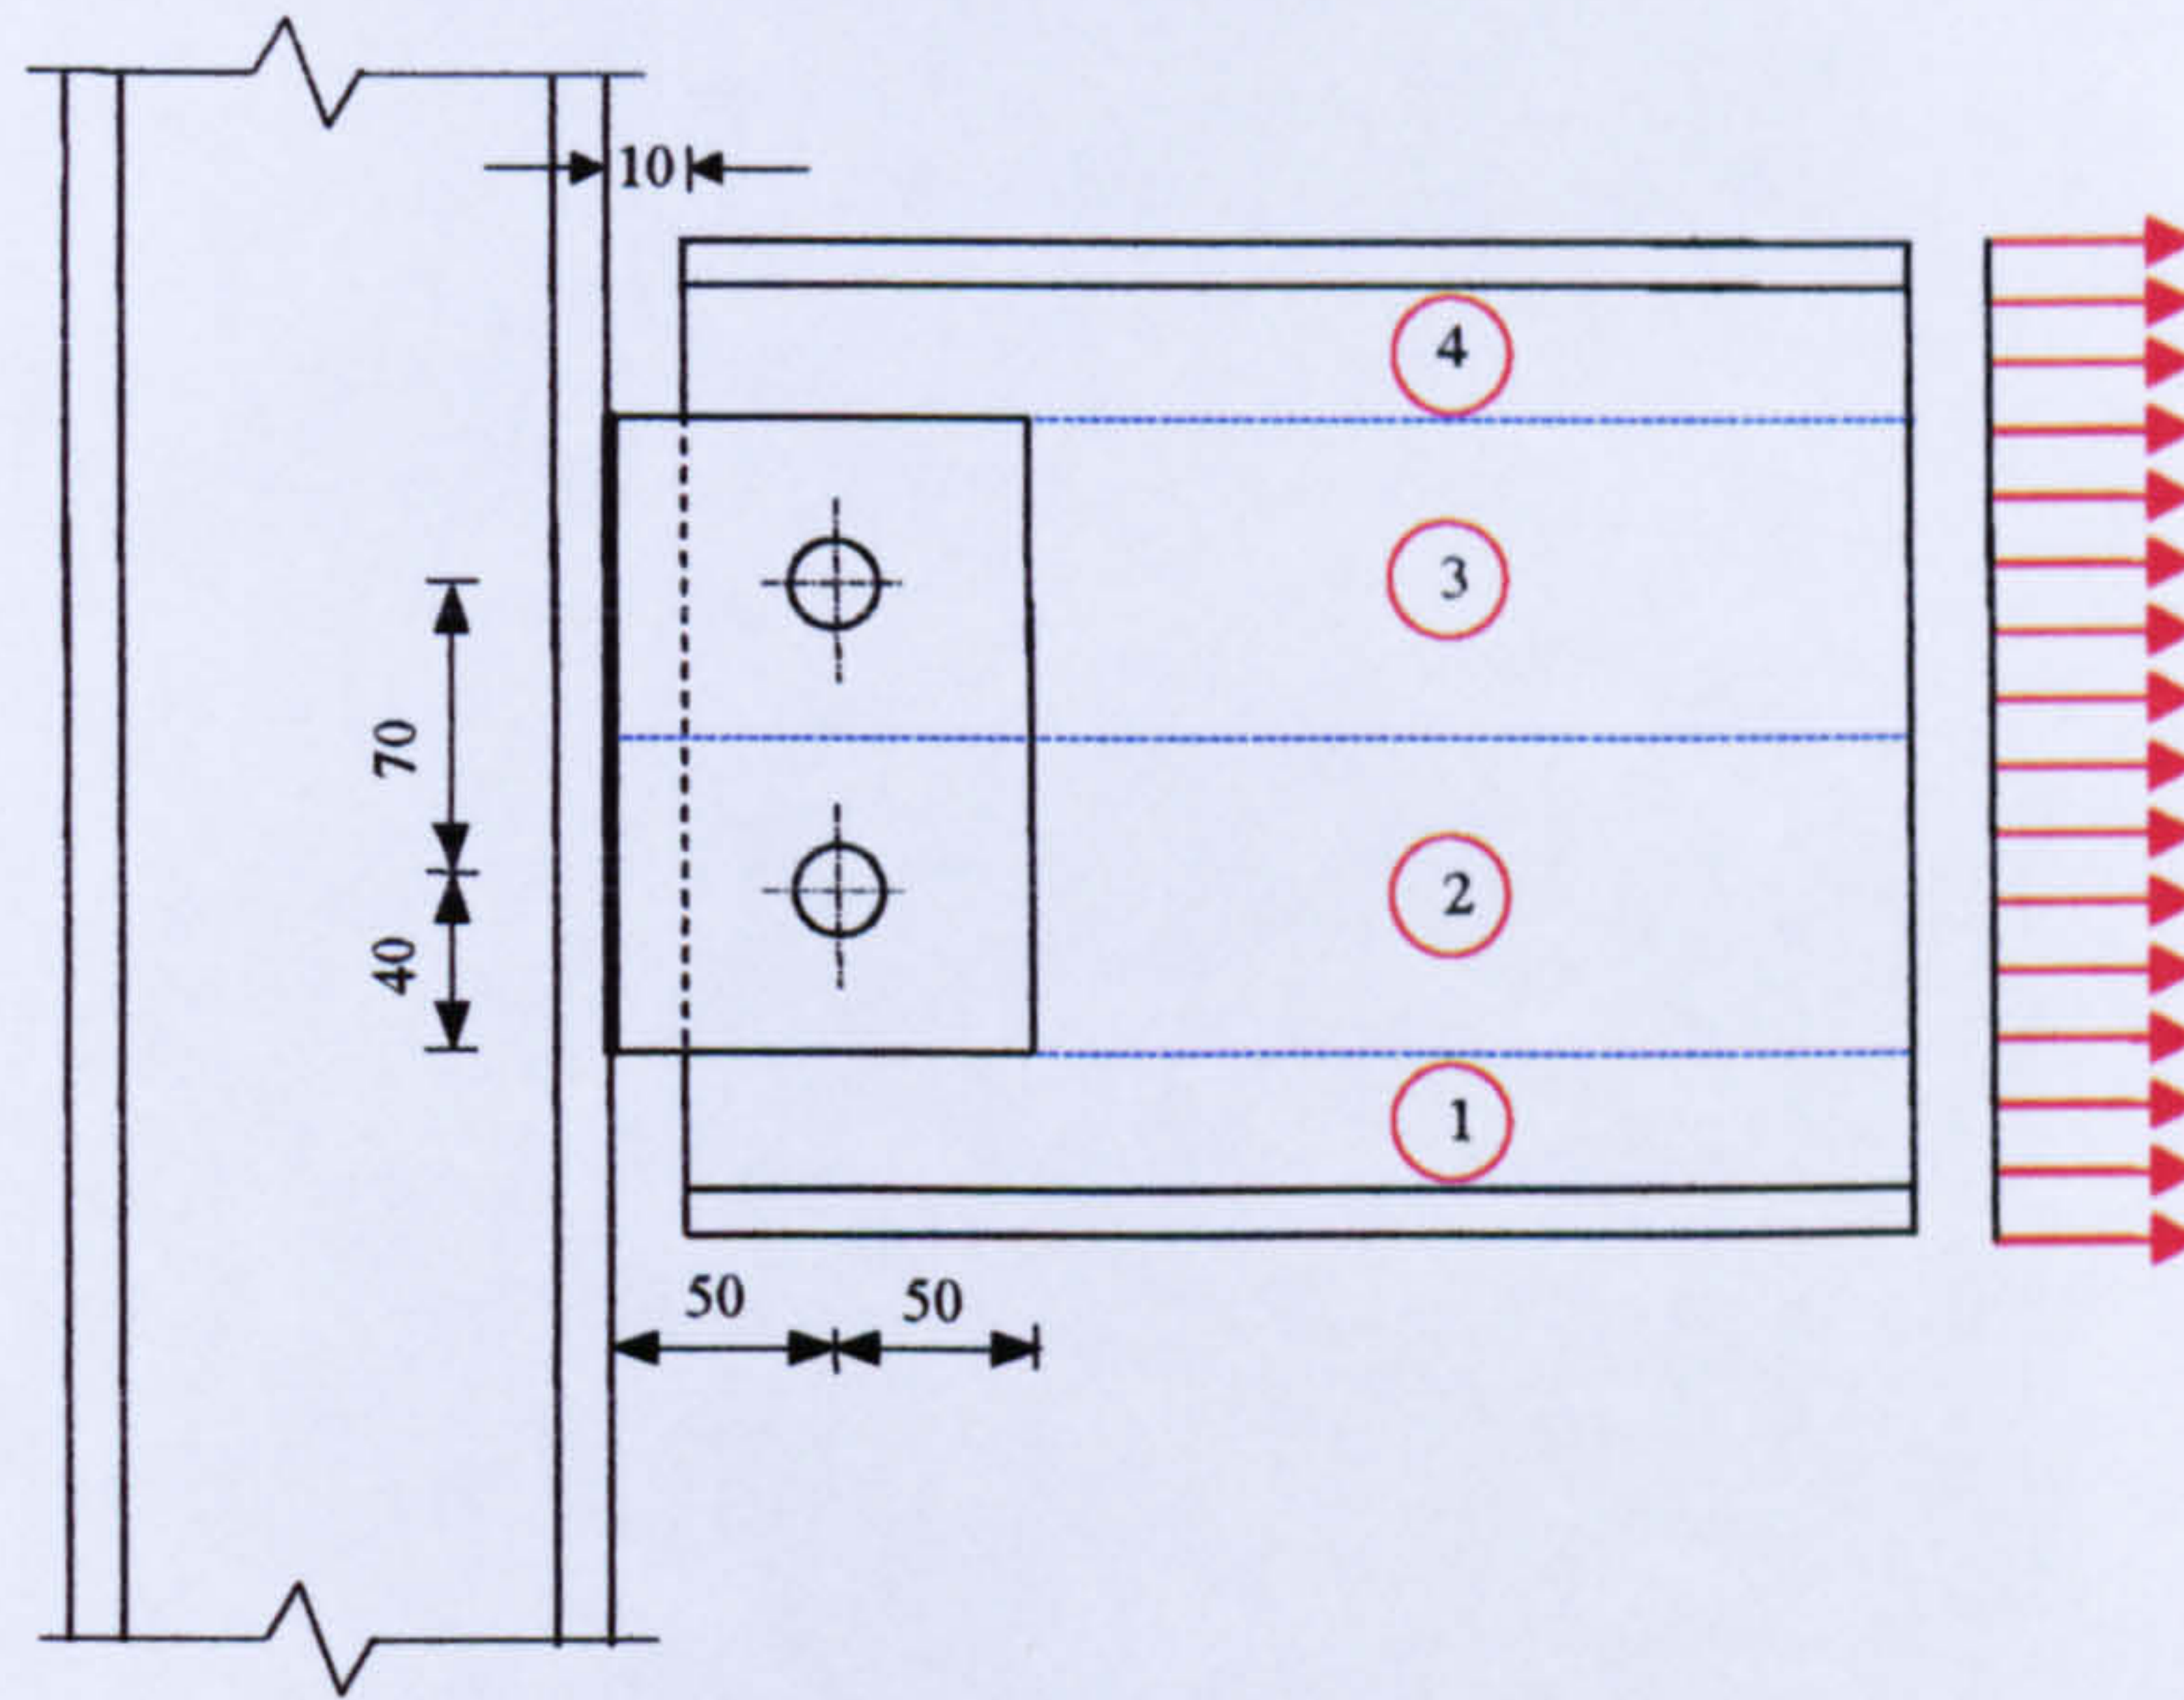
Geometrical details of 2-bolt fin plate connection (Note: dimension are shown in mm)
